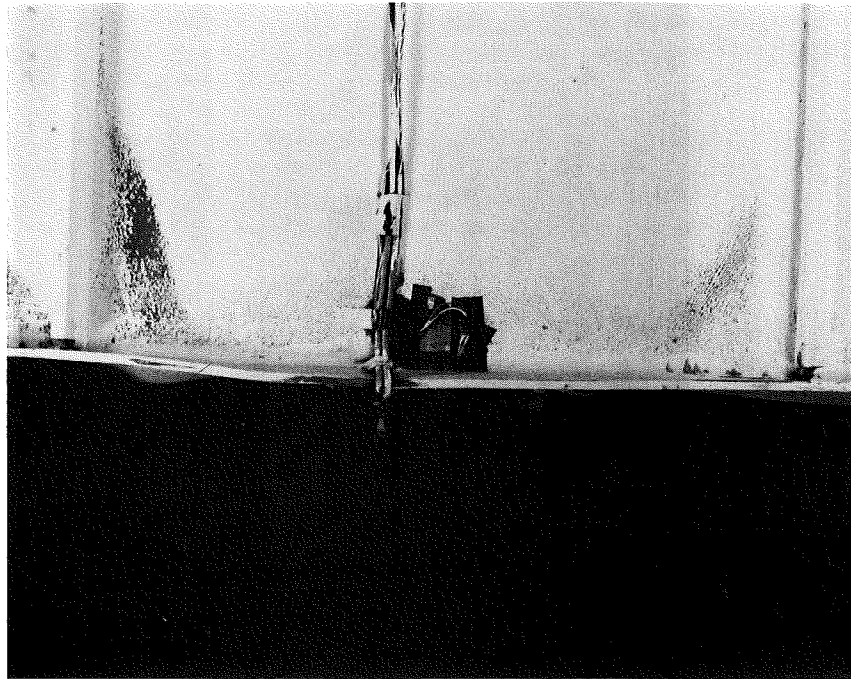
Yielding of Web at Bottom Flange, Panel 11,
